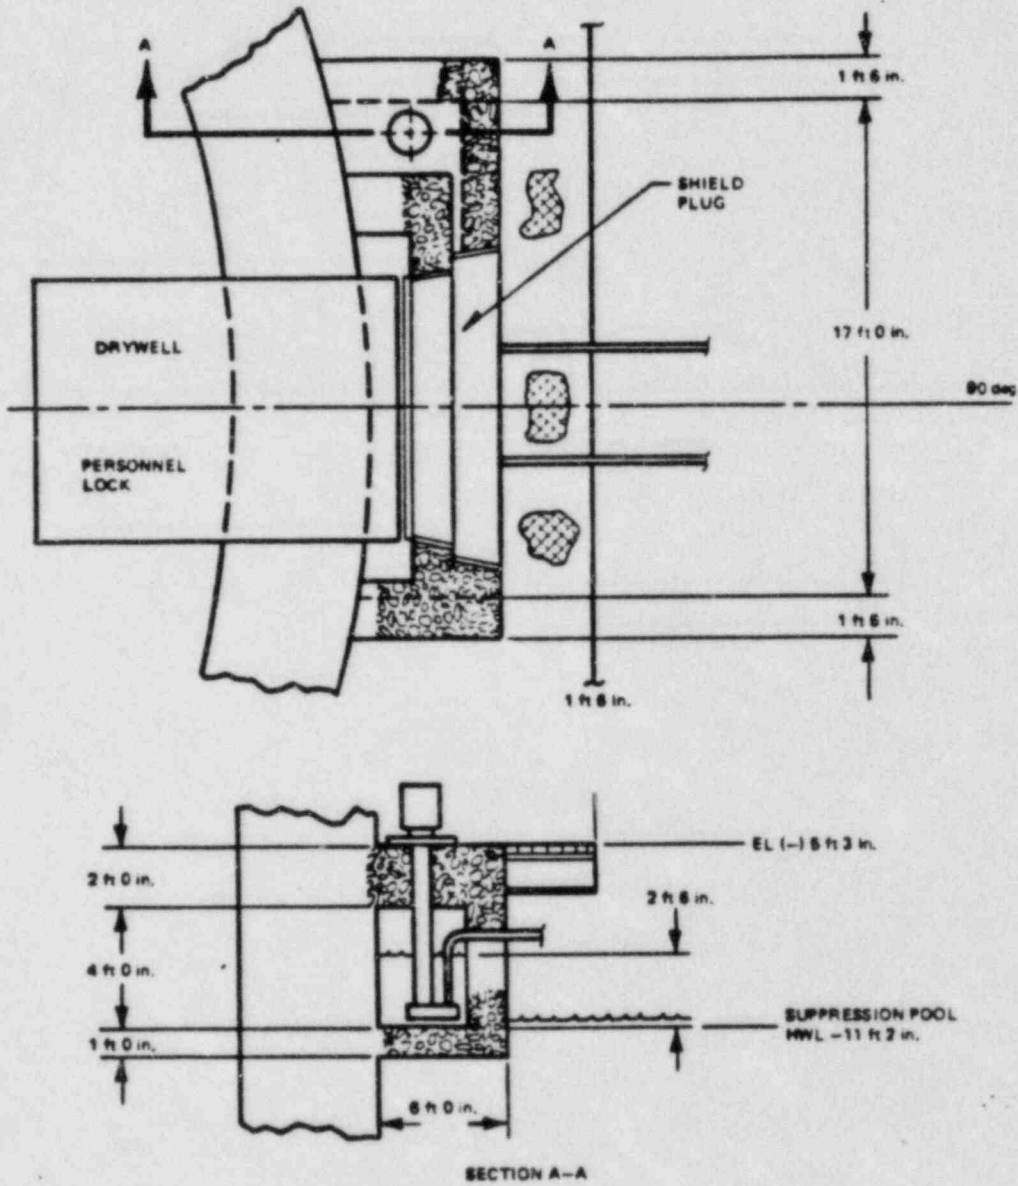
B-3. Containment Equipment Drain Sump - 238 Plant
